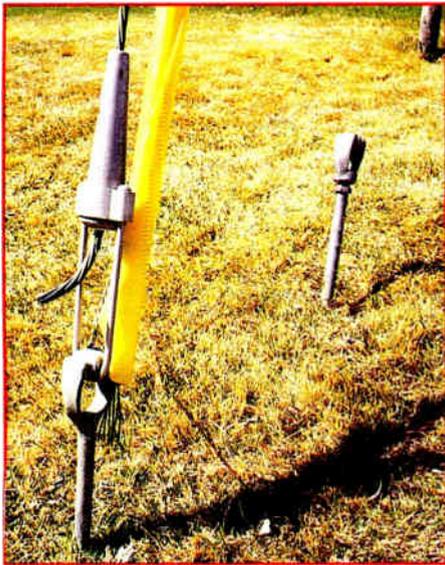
After Load Locker is removed, thimble is screwed onto end of anchor rod, ready for guying.
